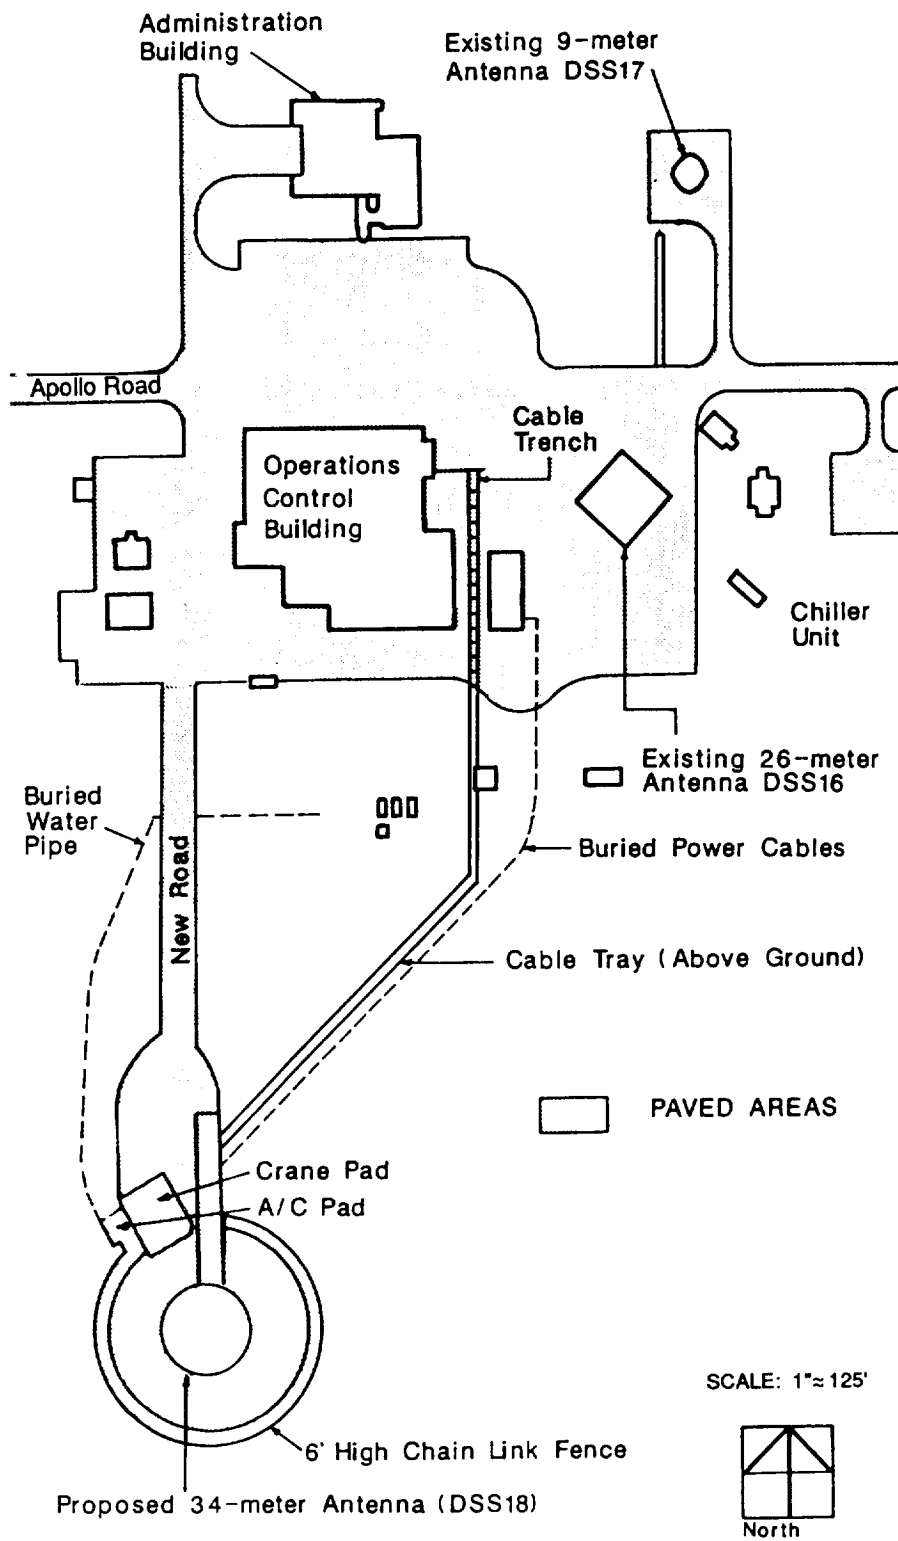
Apollo Site: Site Plan for Proposed New 34-Meter Antenna
